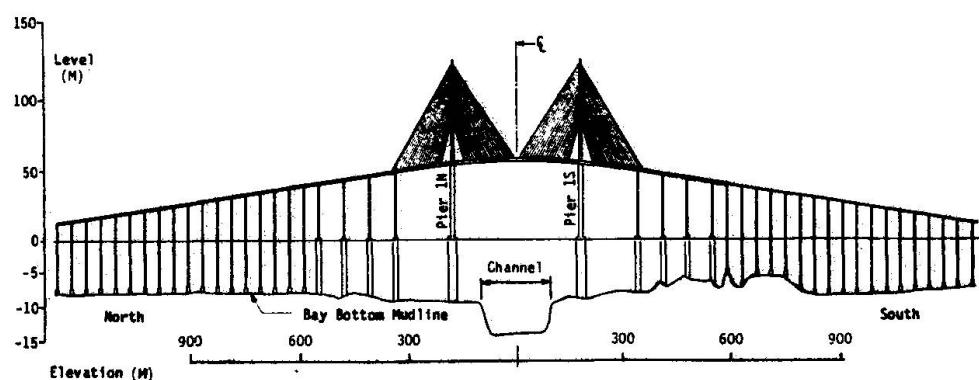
High Level (Main Span) Section of the new Sunshine Skyway Bridge
